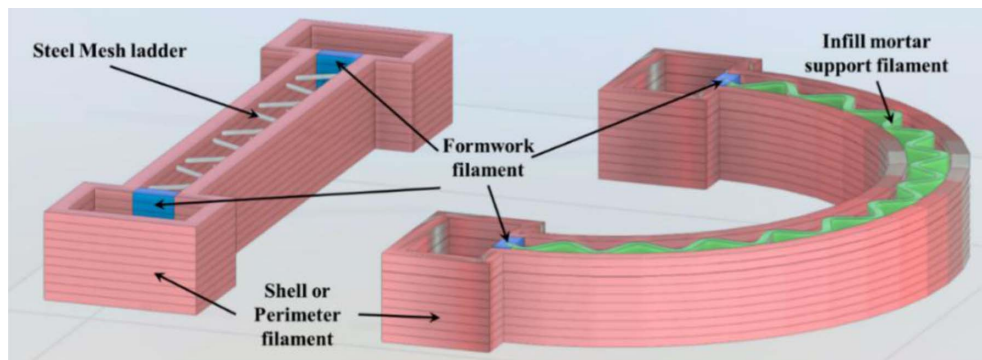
3DCP components (i.e., shell, infill, and formwork filaments, and steel support).
